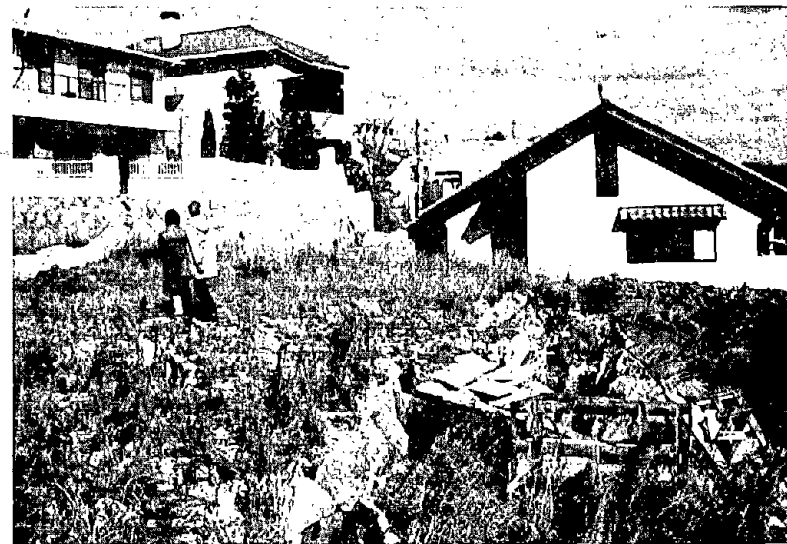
Deep tension cracks in a sidehill fill on a residential lot. Note the separation in the rock retaining wall in the background. This type of damage was typical in this neighborhood.
